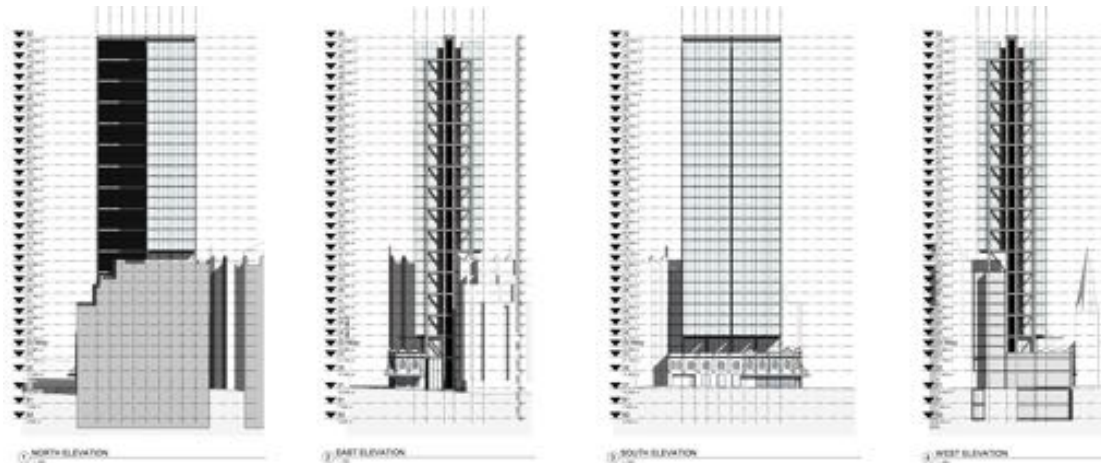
Elevations of the Planning Proposal. Grimshaw Architectural.
